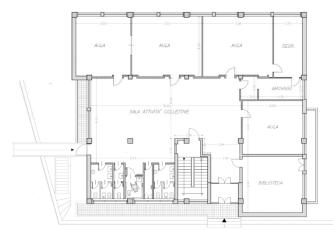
Ground floor plan of the school building under study (source: Loro Piceno Municipality).
